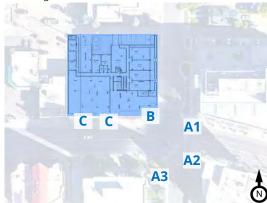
Existing site photo with the proposed development (Photo courtesy of Google Earth)
